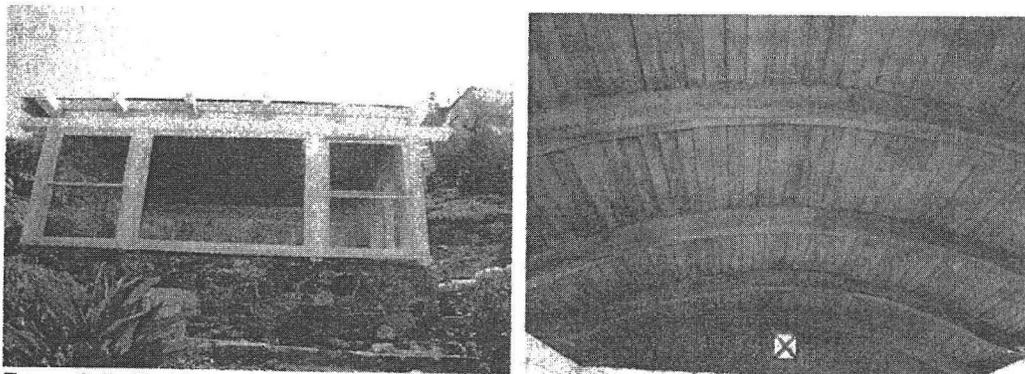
(Left): View of the west facing elevation of the cabana from the top of the redwood stairs showing the un-coursed local rubble stone foundation and the west facing windows. Figure 4 (Right): View of the interior of the cabana's redwood roof showing the curved ceiling joists and tongue and groove planks.
